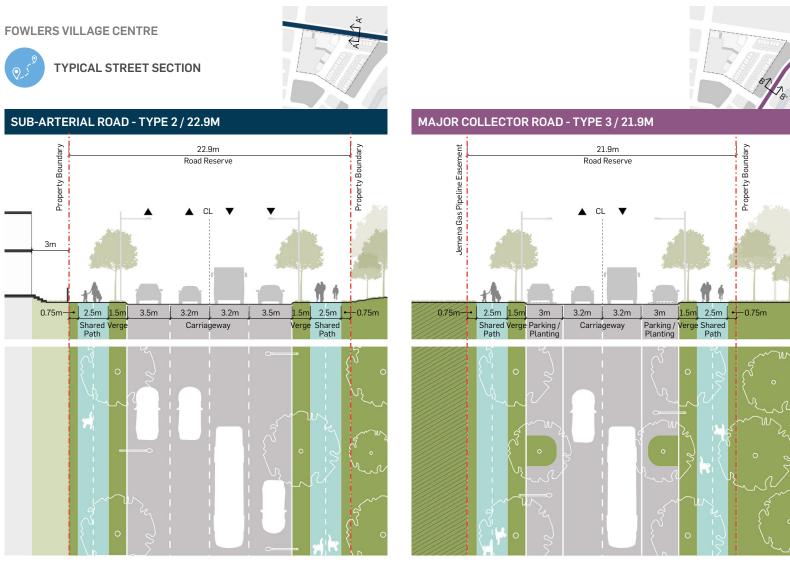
Indicative Street Section A-A' - Sub-Arterial Road - Type 2
